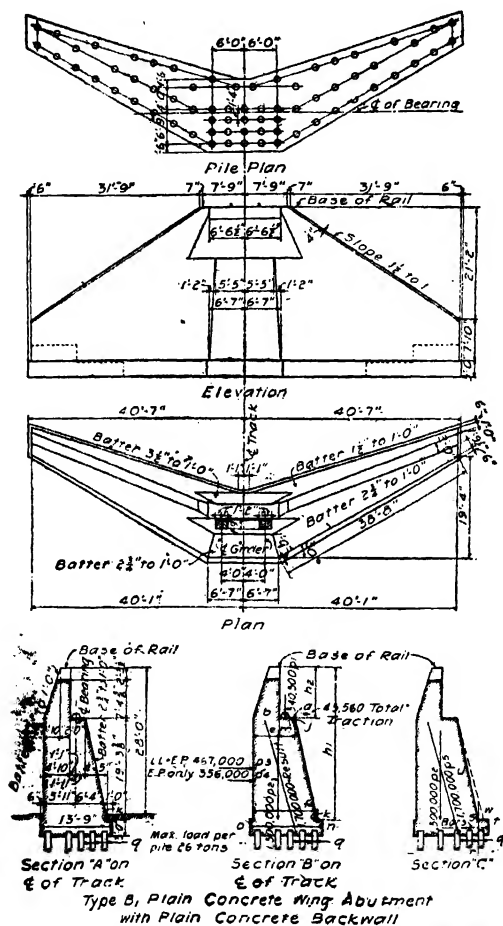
Details of a mass bridge abutment of C. M. & St. P. Ry.
